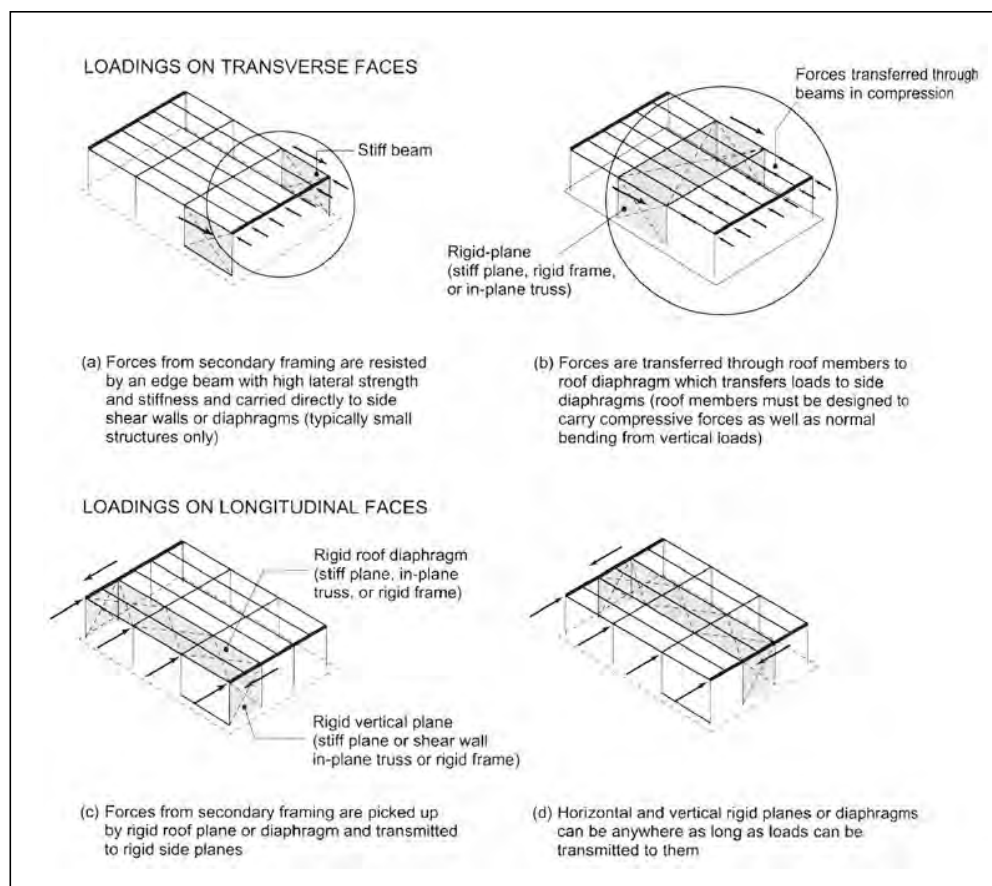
Positioning of lateral force to resisting structural planes.
